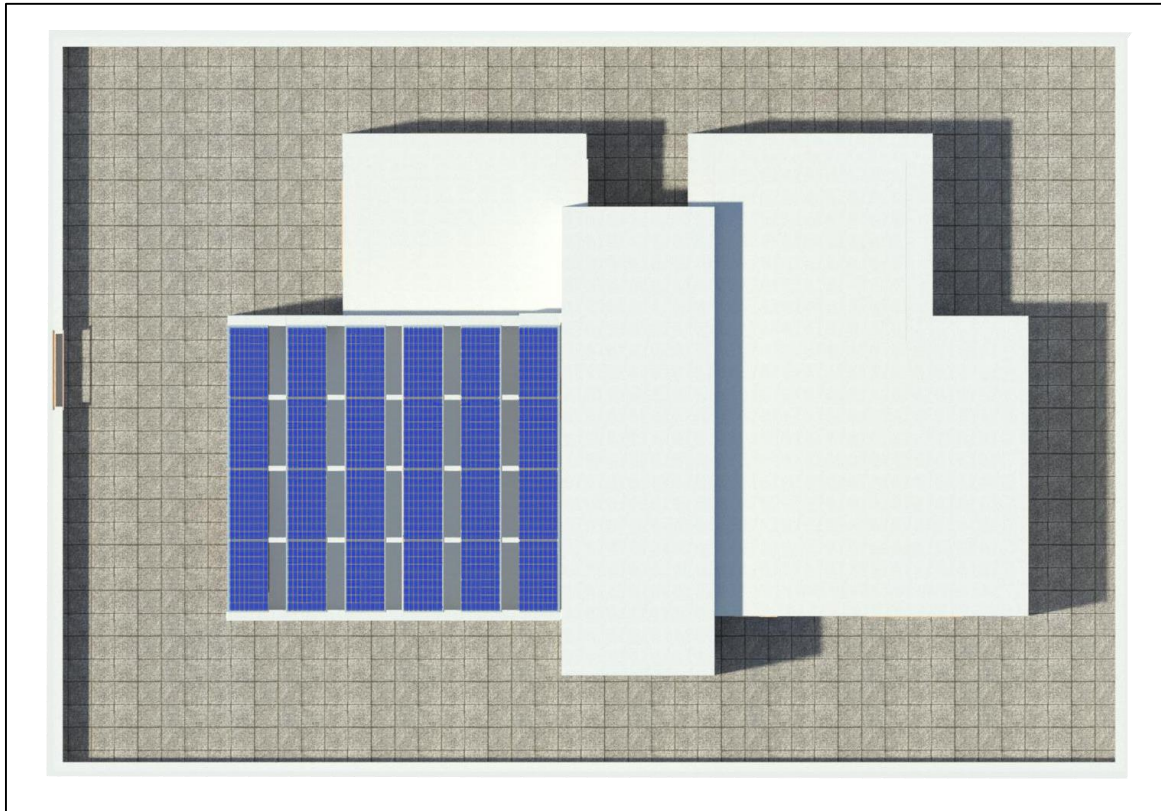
Net-Zero Energy House Site Plan (by author).
